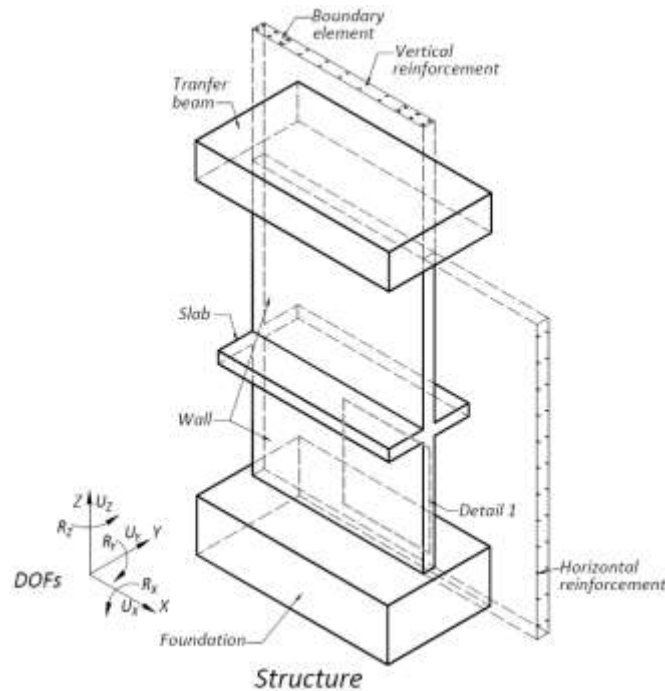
Description of the Beam-Truss Model – Structural component.
